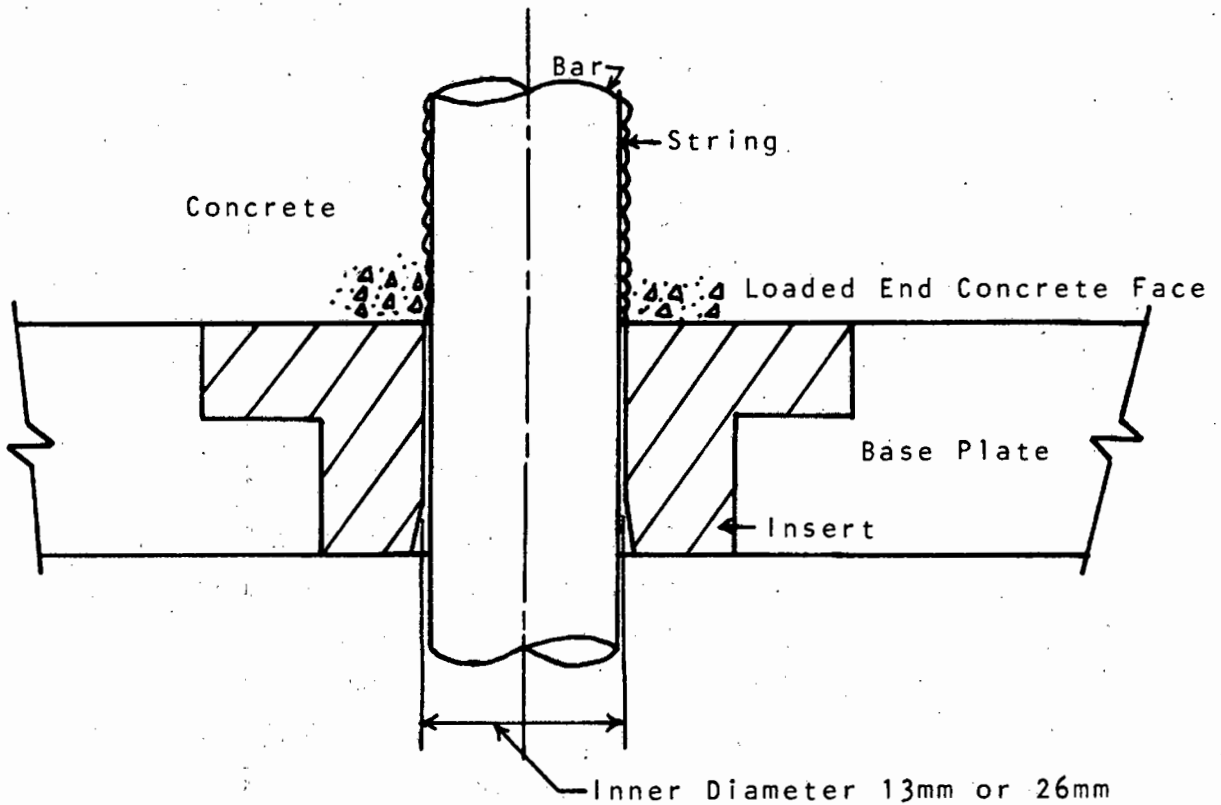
Insert In Base Plate For Locating Bar In Mould.
